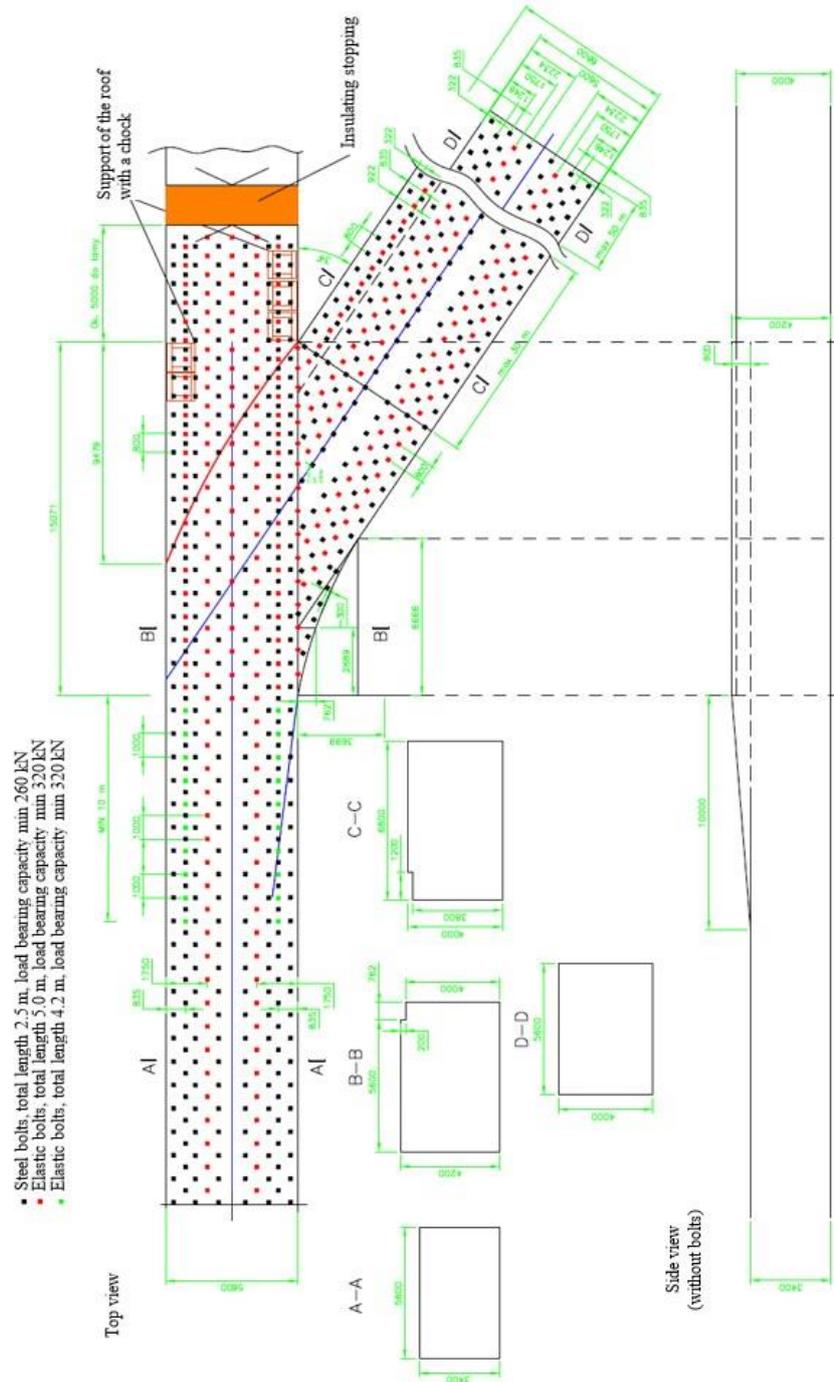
Driving method of bend No. 2 in the Bw-1n test roadway – Stage III [134]
